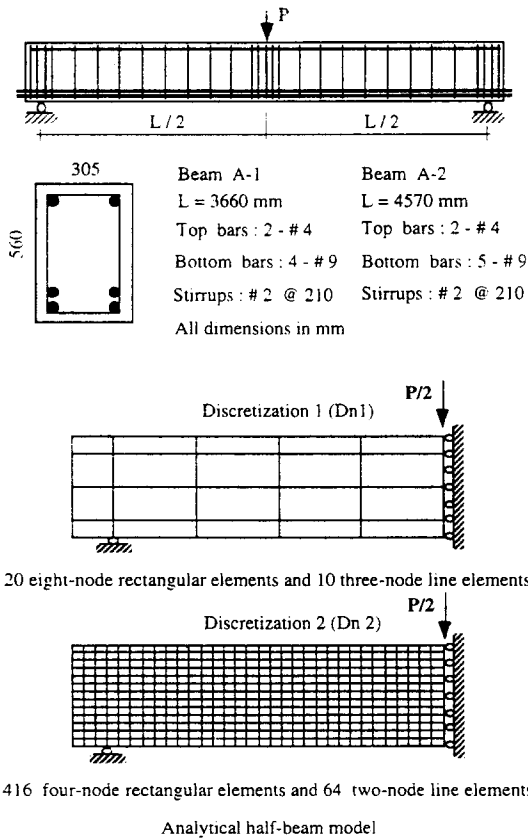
Reinforced concrete beam tested by Bresler and Scordelis
